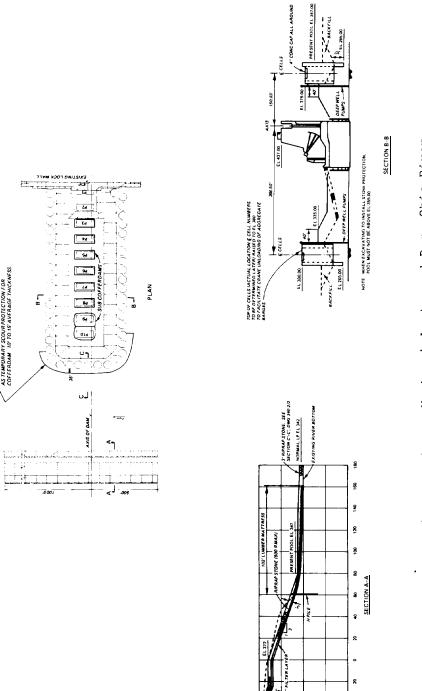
Cofferdam scheme, Newburgh Locks and Dam, Ohio River
